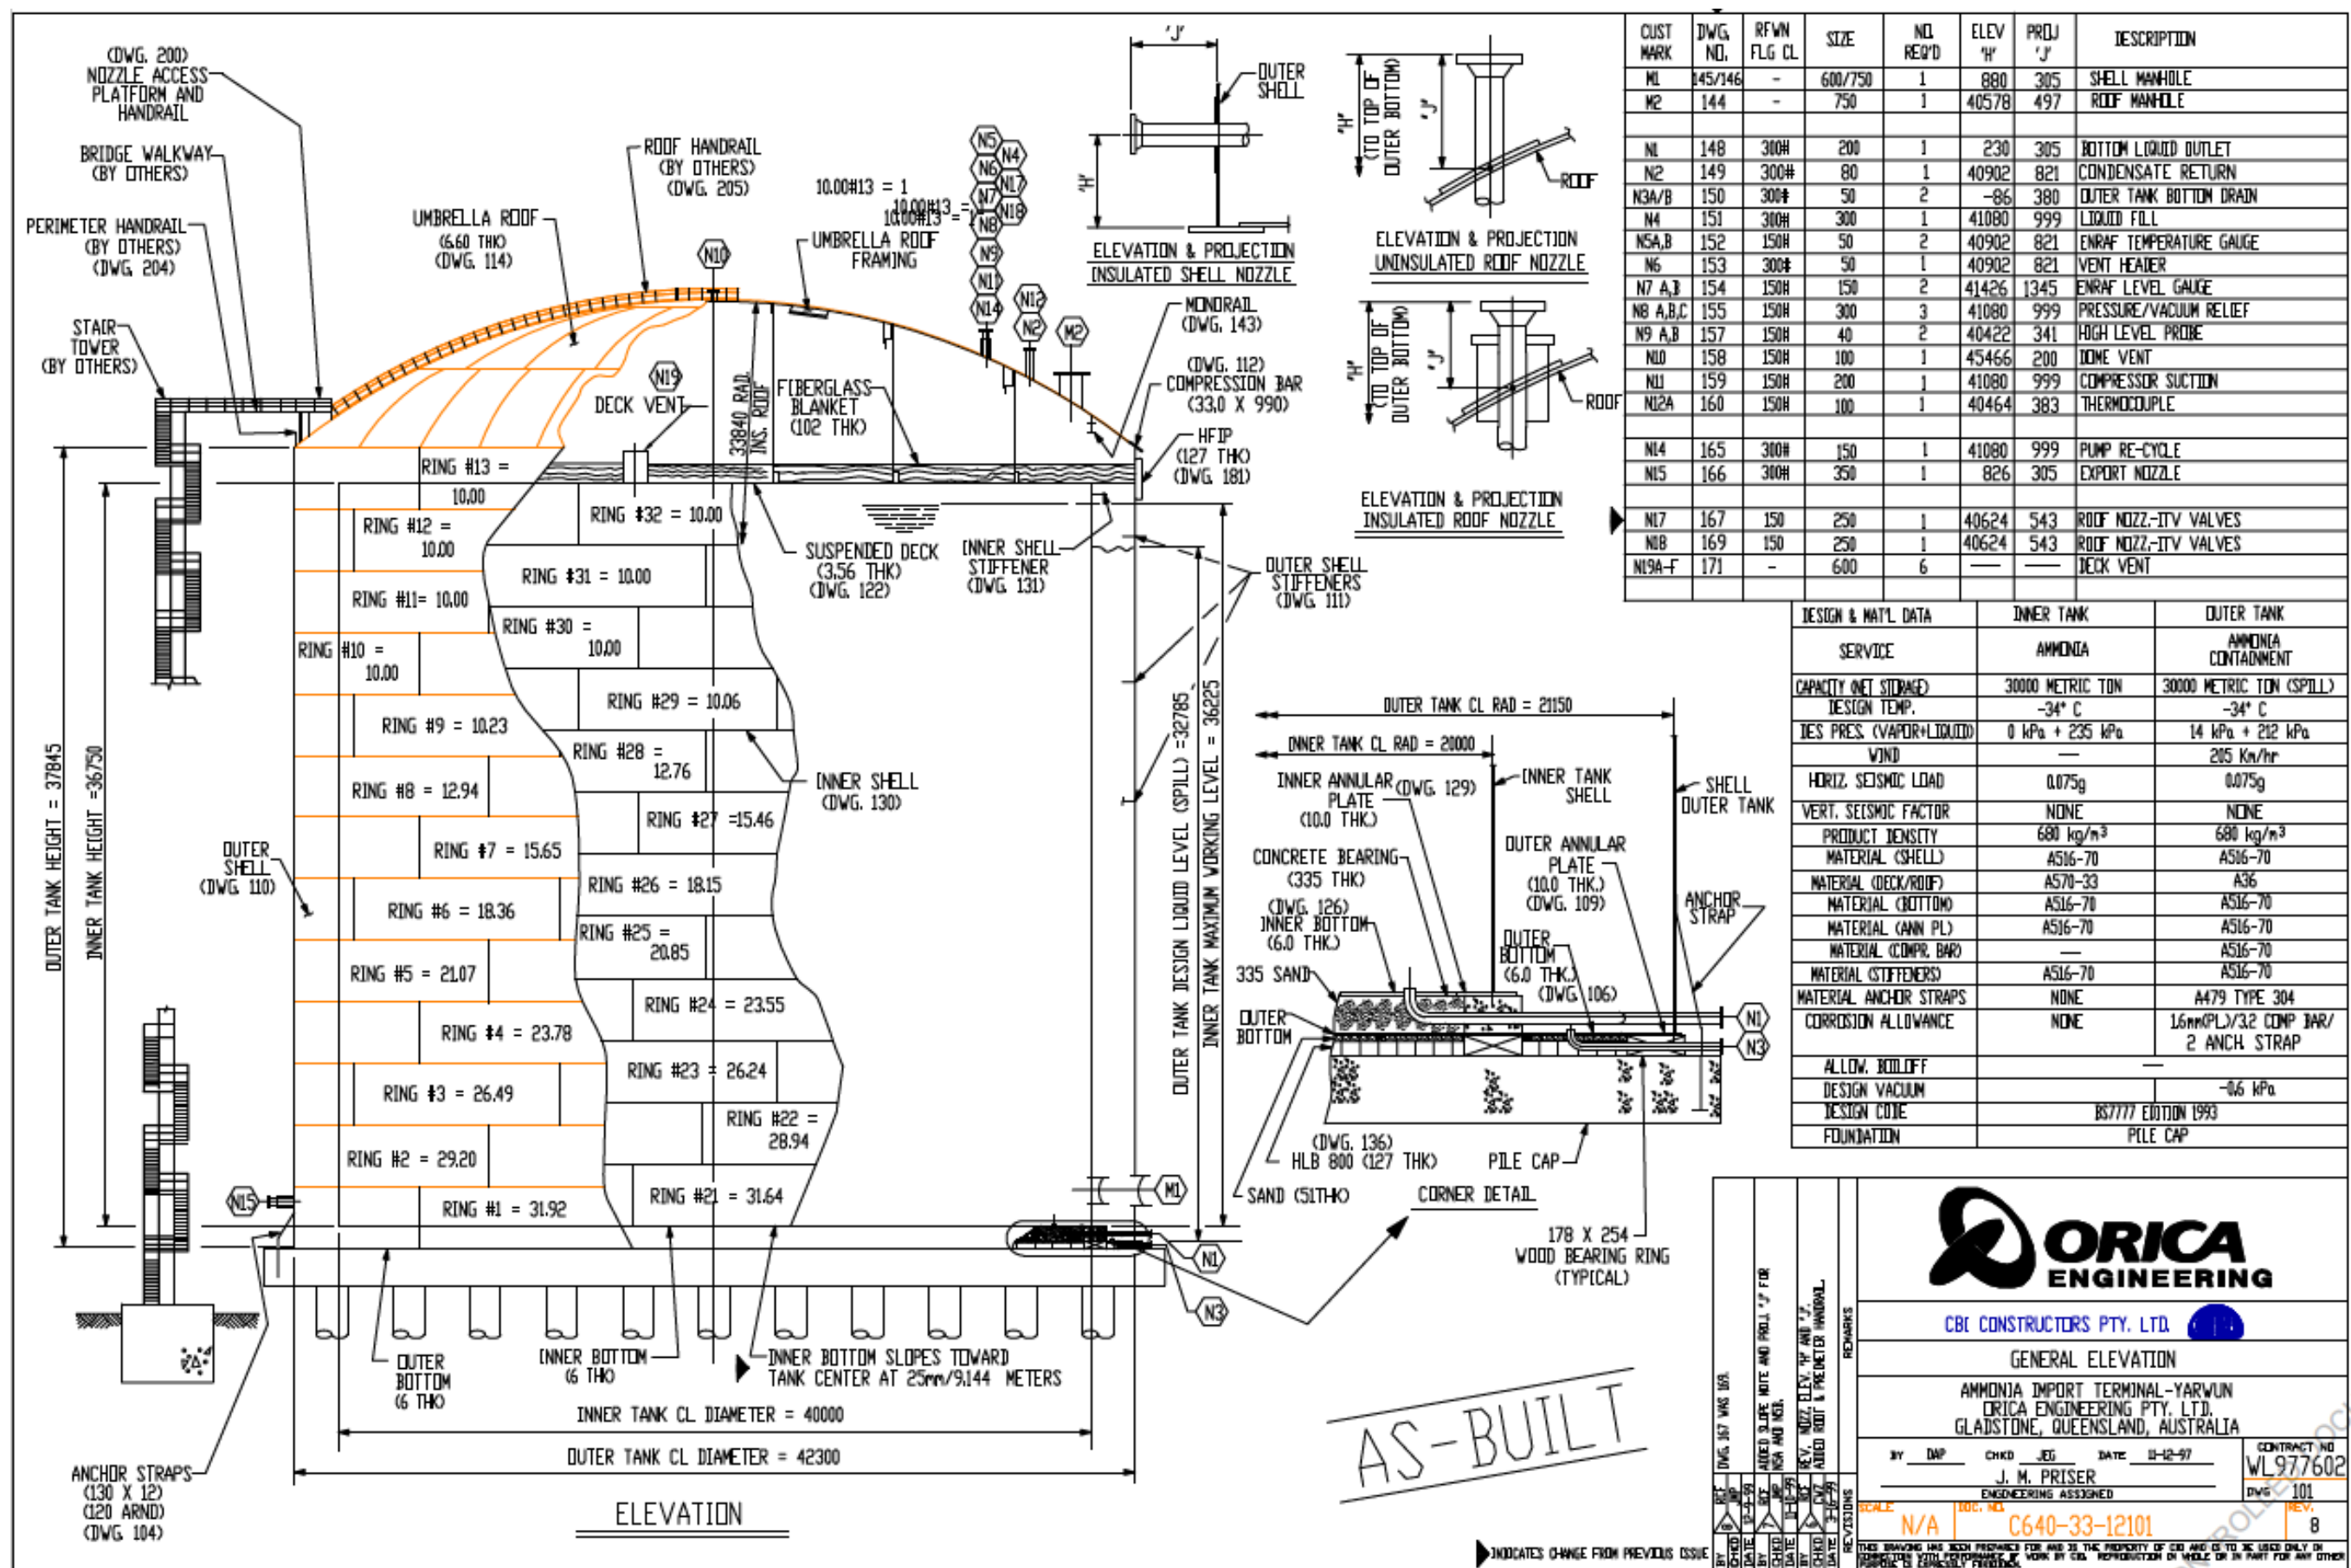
Indicative schematic arrangement of proposed tank – elevation (Based on Yarwun design)
